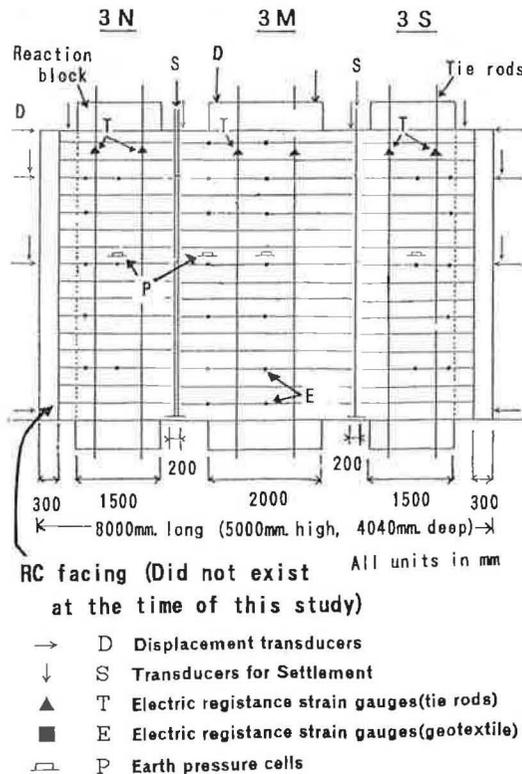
Cross-section of the test section with three PL/PS GRS test segments
